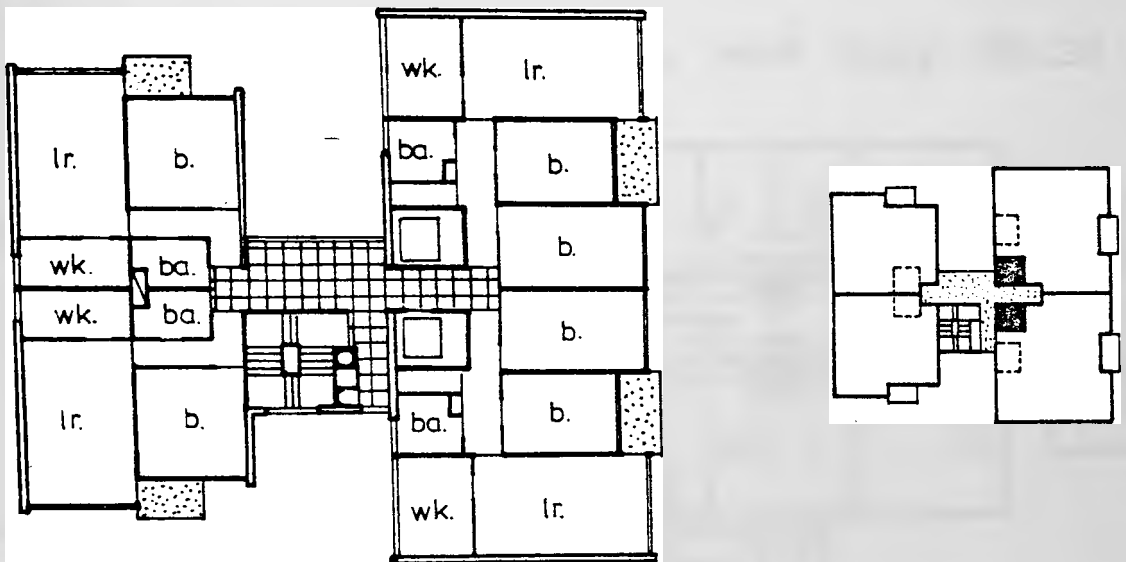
TYPICAL FLOOR PLAN OF AN 11 STOREY TOWER BLOCK. HARLOW NEW TOWN.
